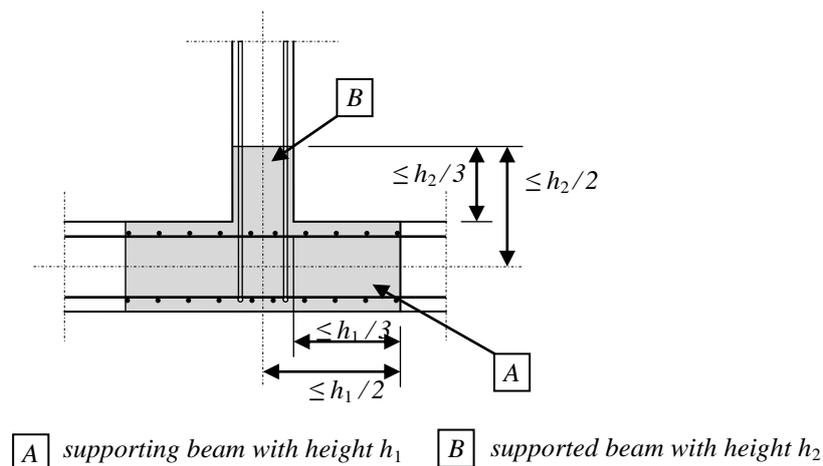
Placing of supporting reinforcement in the intersection zone of two beams (plan view). The figure is based on SIS (2008).
